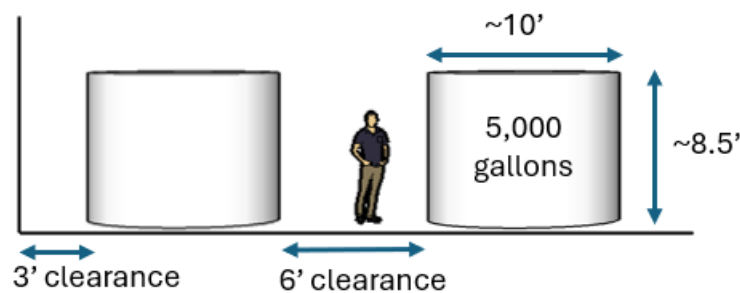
ELEVATION SECTION VIEW OF TANK
